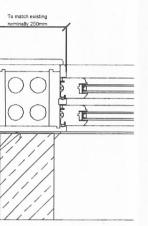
Plan of Typical Window (9 over 9) 1:20
